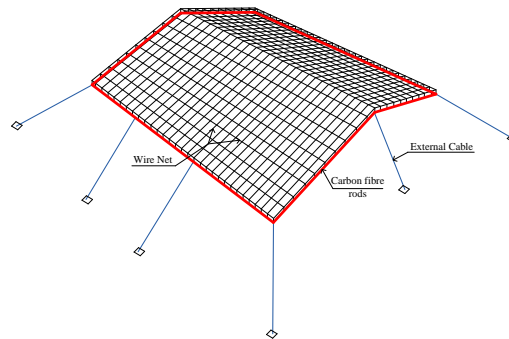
Restrofit system proposed by Dessouki and El Damatty (2010)
